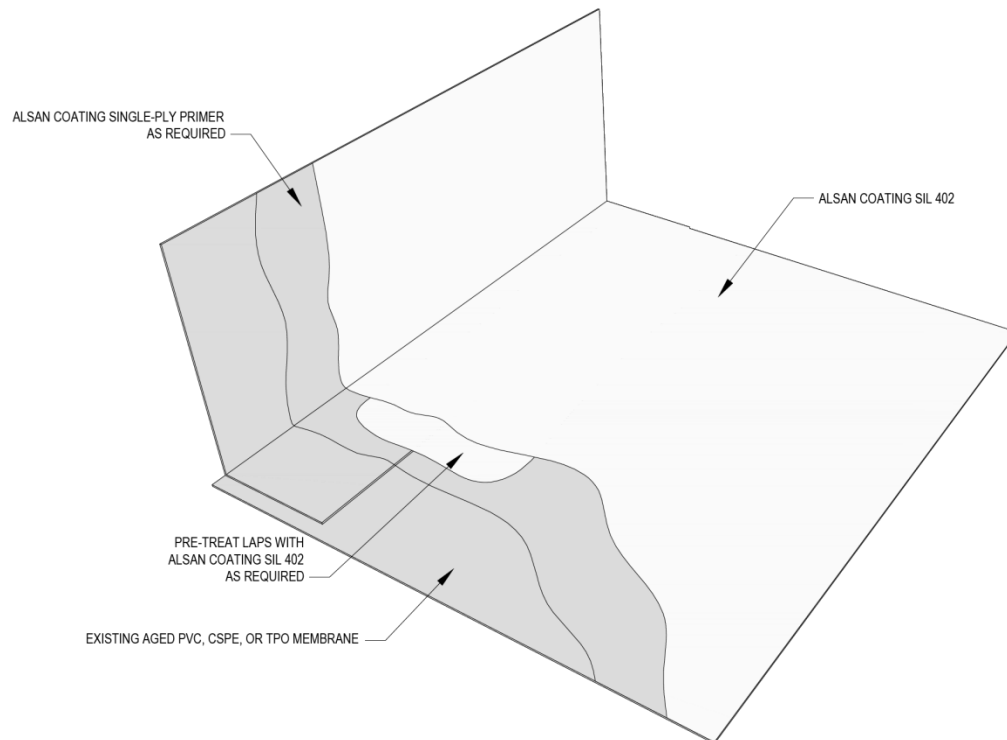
Silicone Roof Coating Over Aged TPO/CSPE/PVC, Wall/Curb
